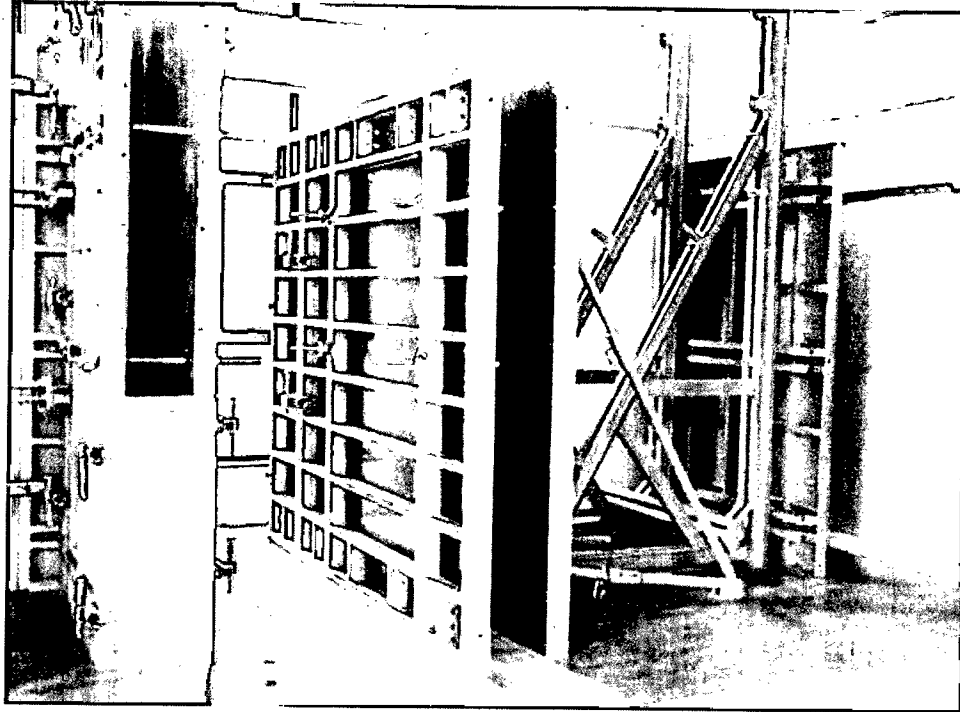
Type 1: Precast Concrete Framing and Wall System
